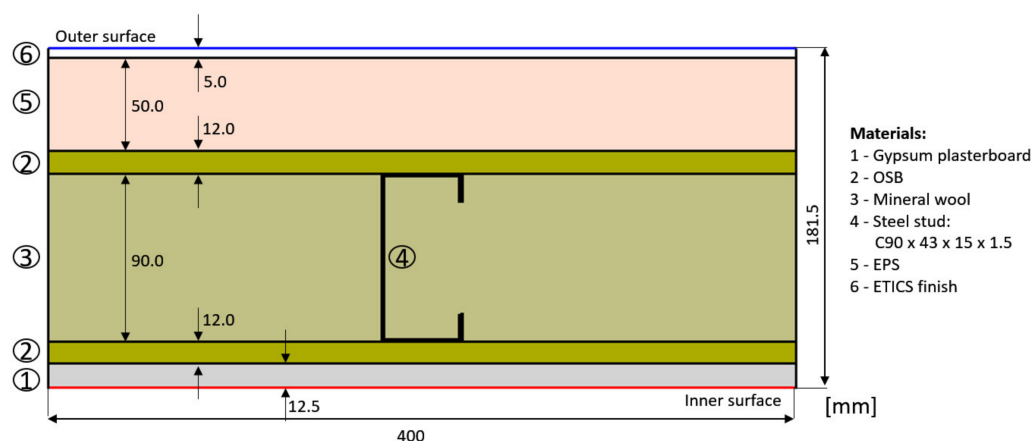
Horizontal cross-section of reference load-bearing facade LSF wall.
